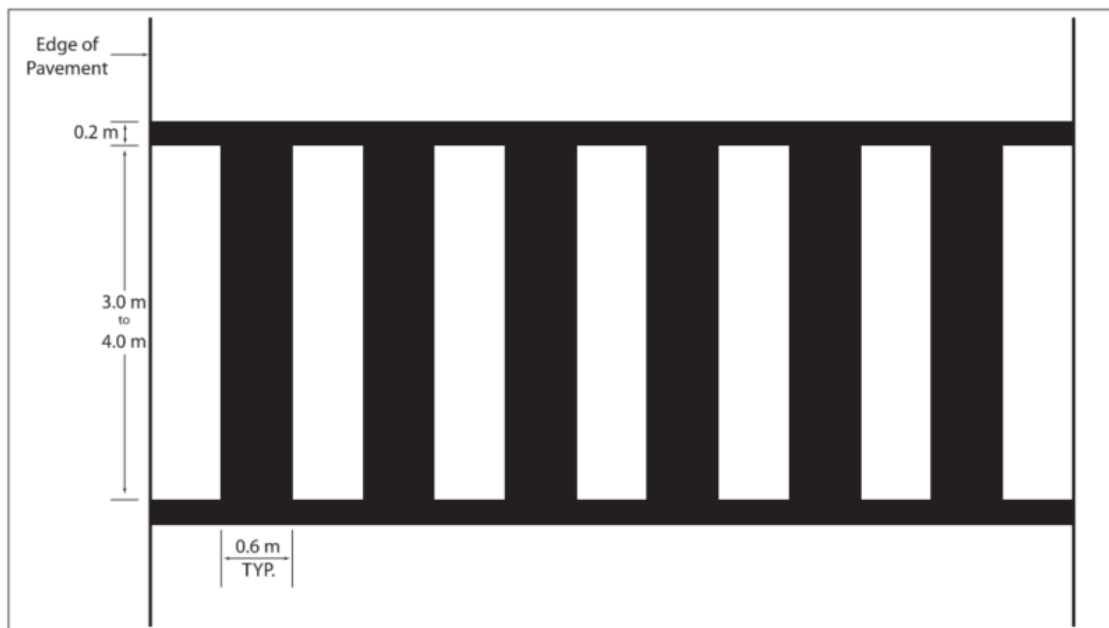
Typical Ladder Crosswalk Markings (Source: OTM Book 15)
